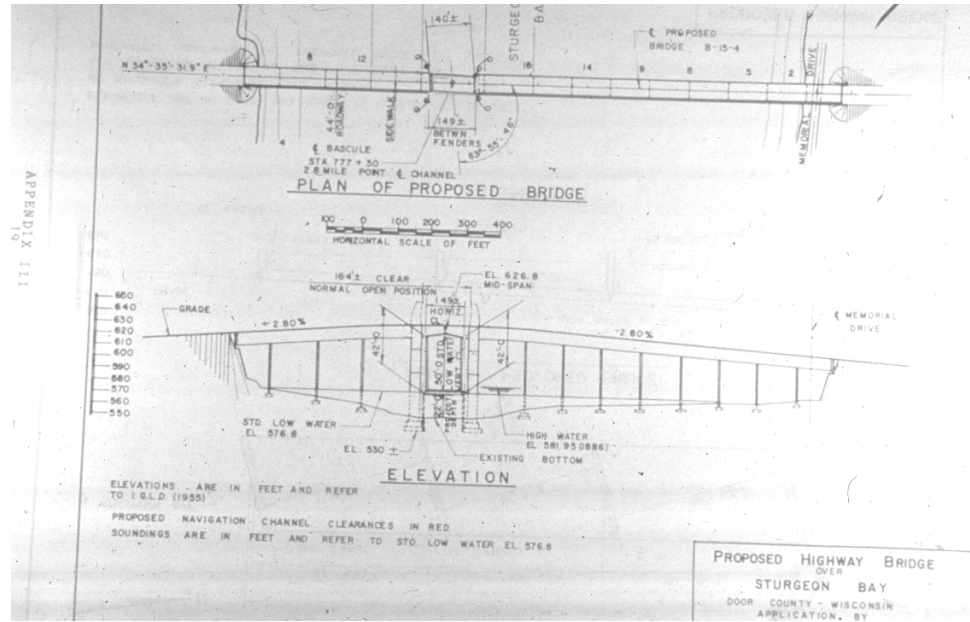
Typical “Permit Drawing” Showing Channel Width and Underclearance in Closed and Open Position
